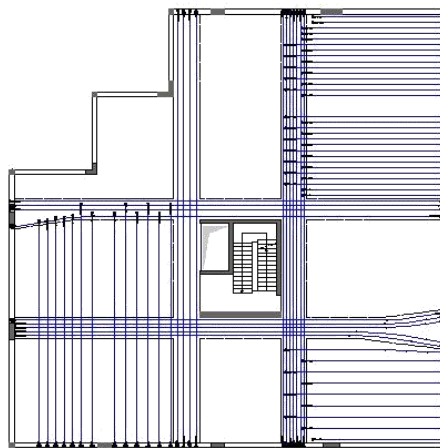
Post-Tensioning layout for bands slab solution 2.
